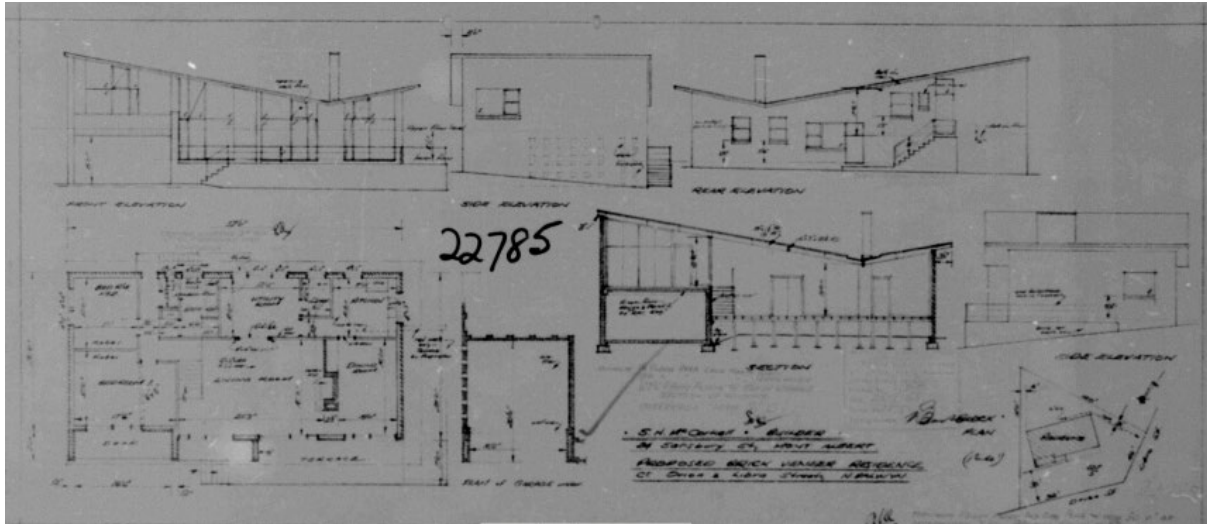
Working drawing sheet for 24 Orion Street, Balwyn North showing floor plan, elevations, section and site plan (Source: BP 22785)
